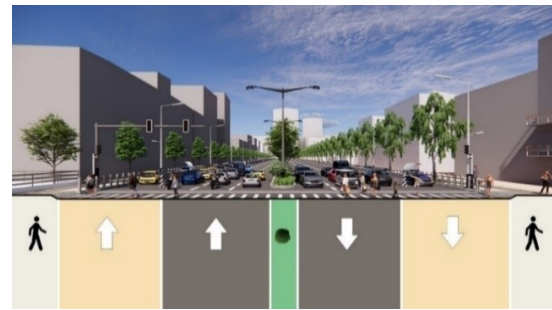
Perspective sectional view of 50m wide road (East side, Section at DD)
